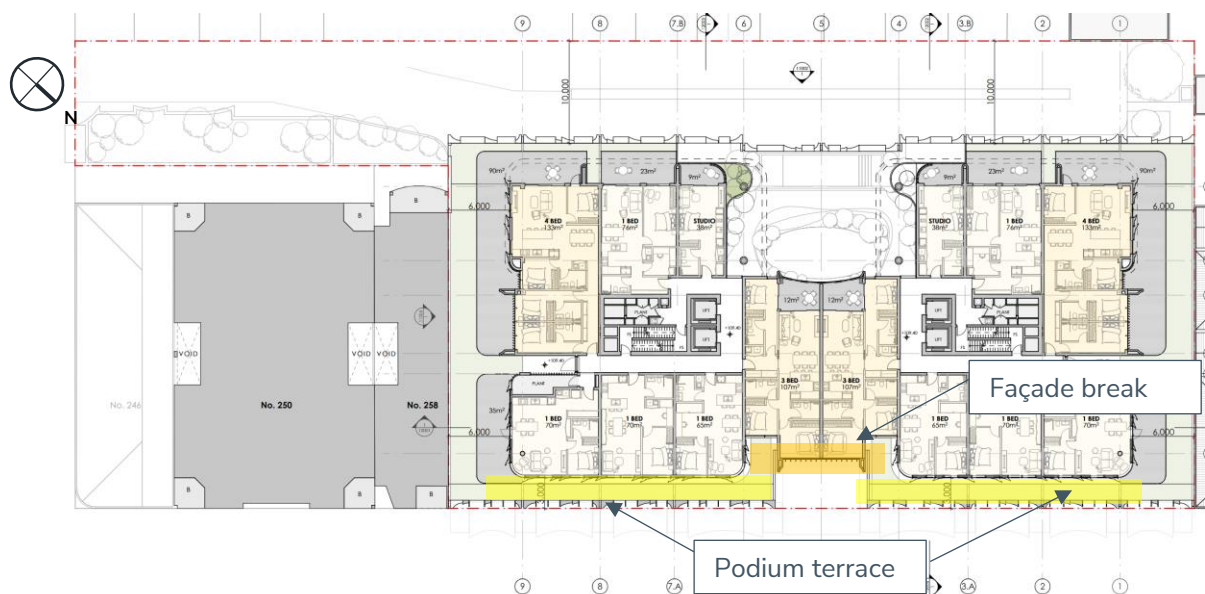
Level 3 plan view, with podium terrace and façade break indicated.
